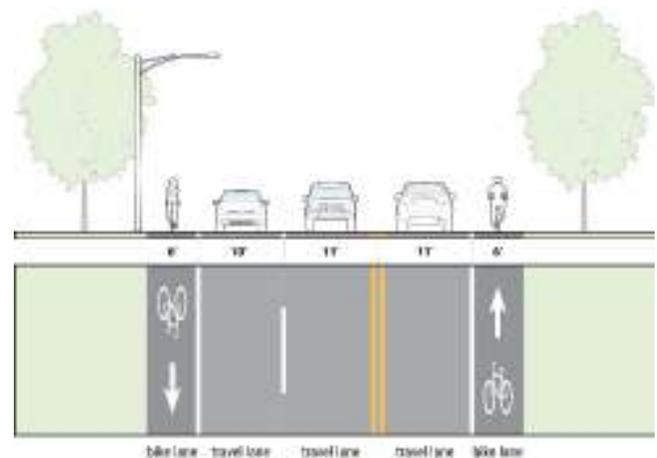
Hammond Pond Parkway Segment 3 Short-Term Typical Cross Section
